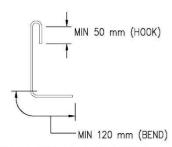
(i) TYPICAL DETAILS OF TRIMMER BARS FOR WALL RECESS
